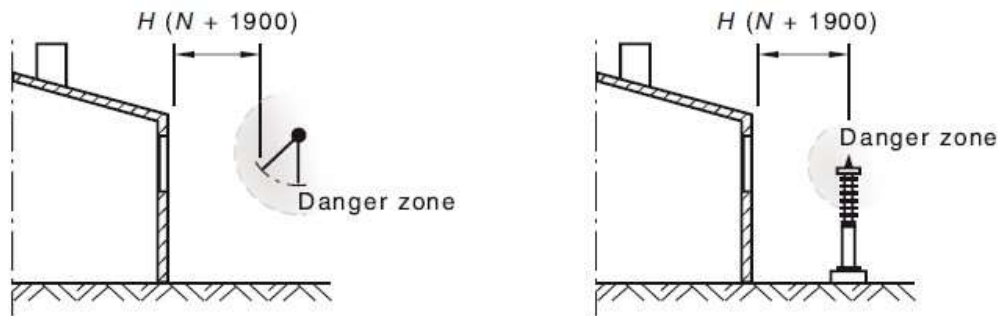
Approaches to buildings within substation – outer wall without windows (from AS2067 figure 5.9)
